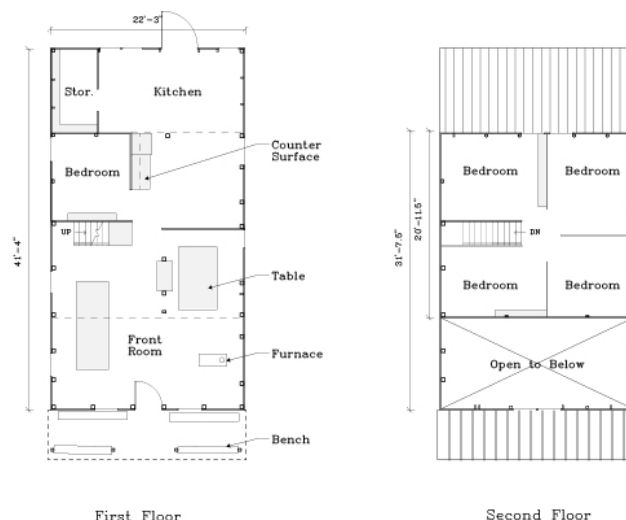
Plan drawing of Tent 32 at Cypress Campground
